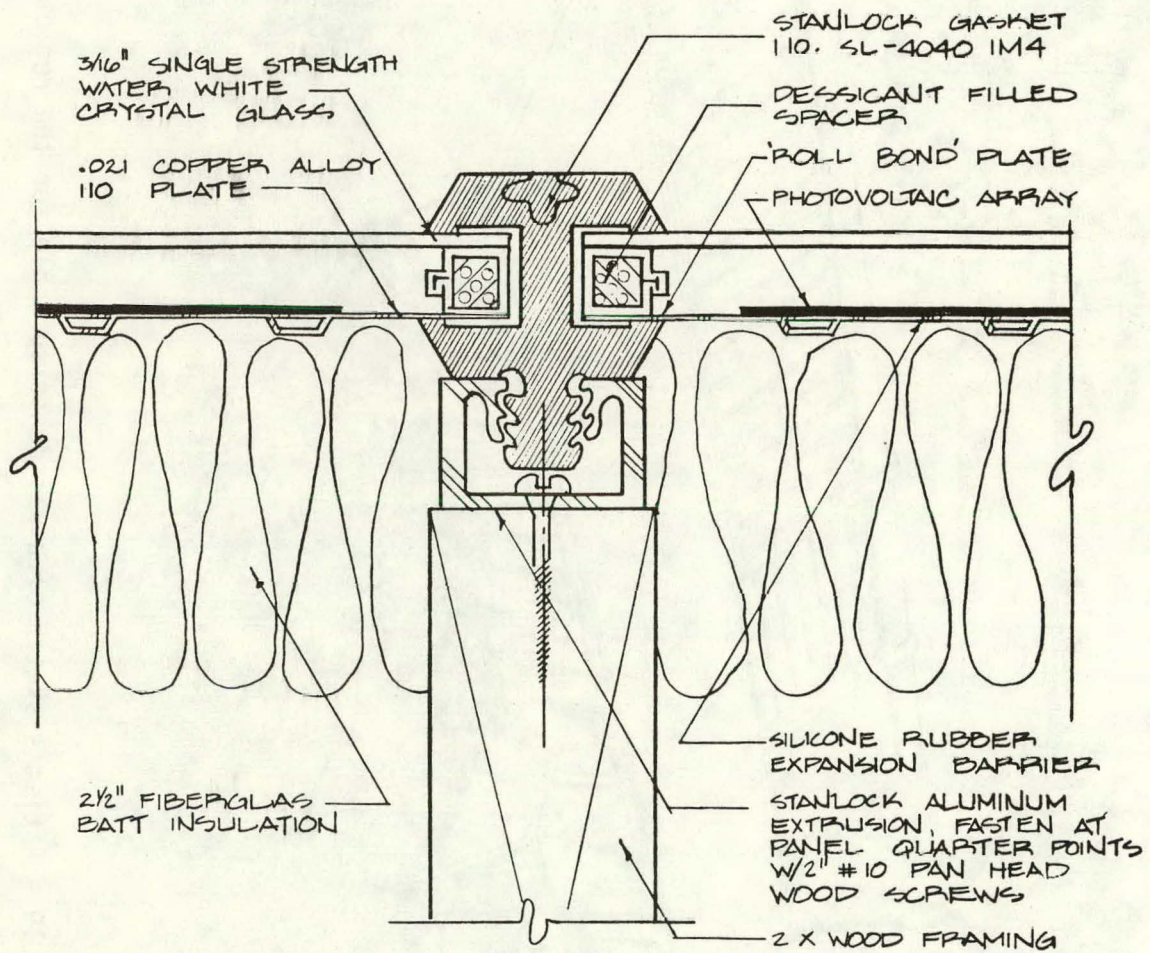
RPS proposed collector framing sloped joint detail
